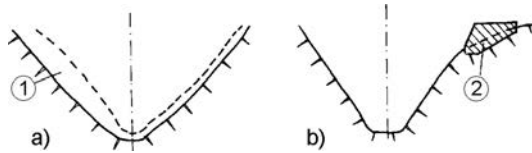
Improvement of the symmetry of profile. (1) Excavation; (2) concrete block.
